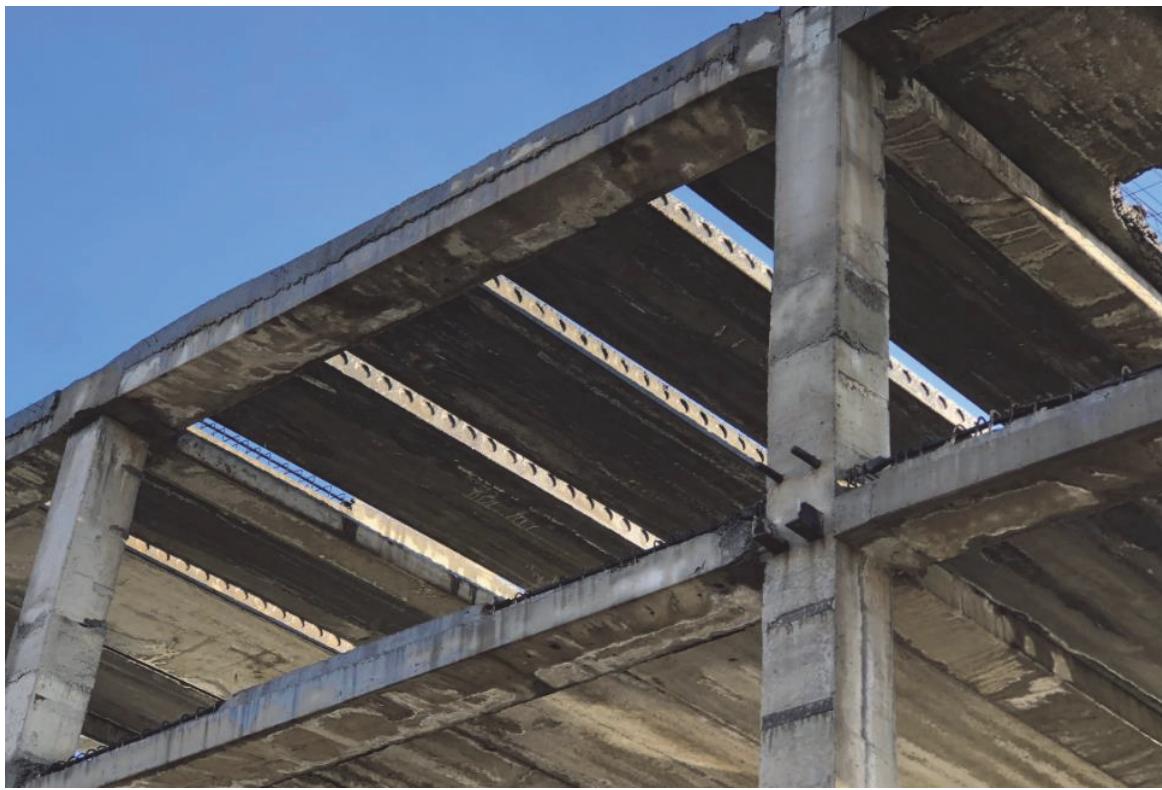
Beam-column connection in typical precast lateral-load-resisting system.
